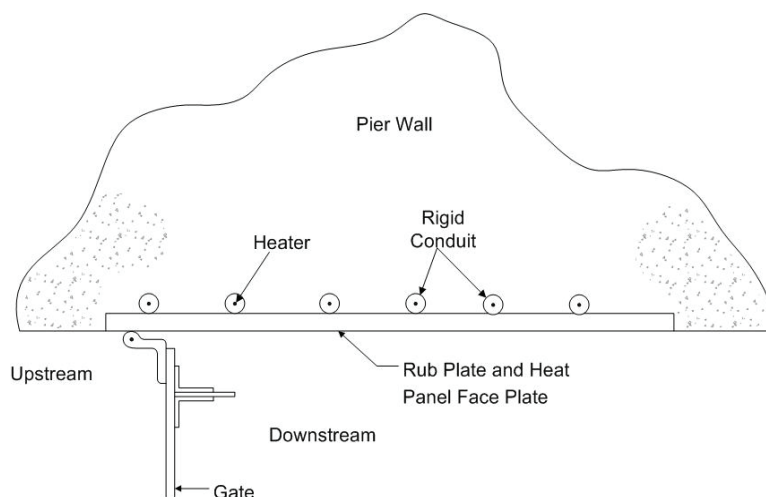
Cross-section of a heater panel embedded into a pier wall.
